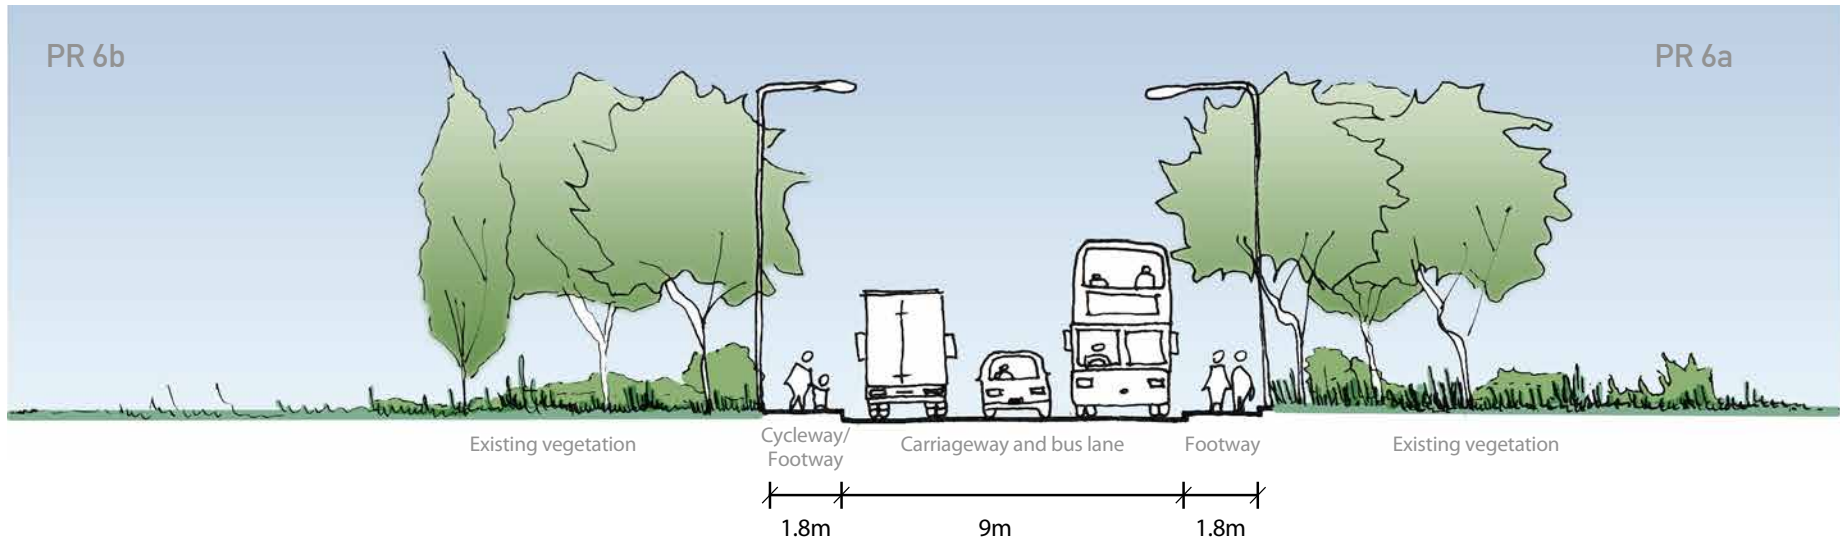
A-A – existing Oxford Road cross section (refer to Fig. 18 for section location)
